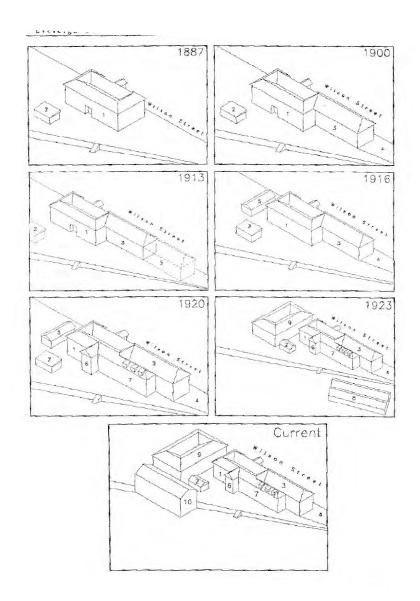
3D development drawings of the CME Building and the surrounding building (Source: Rappoport & Caldis Cook Group, 1997)
